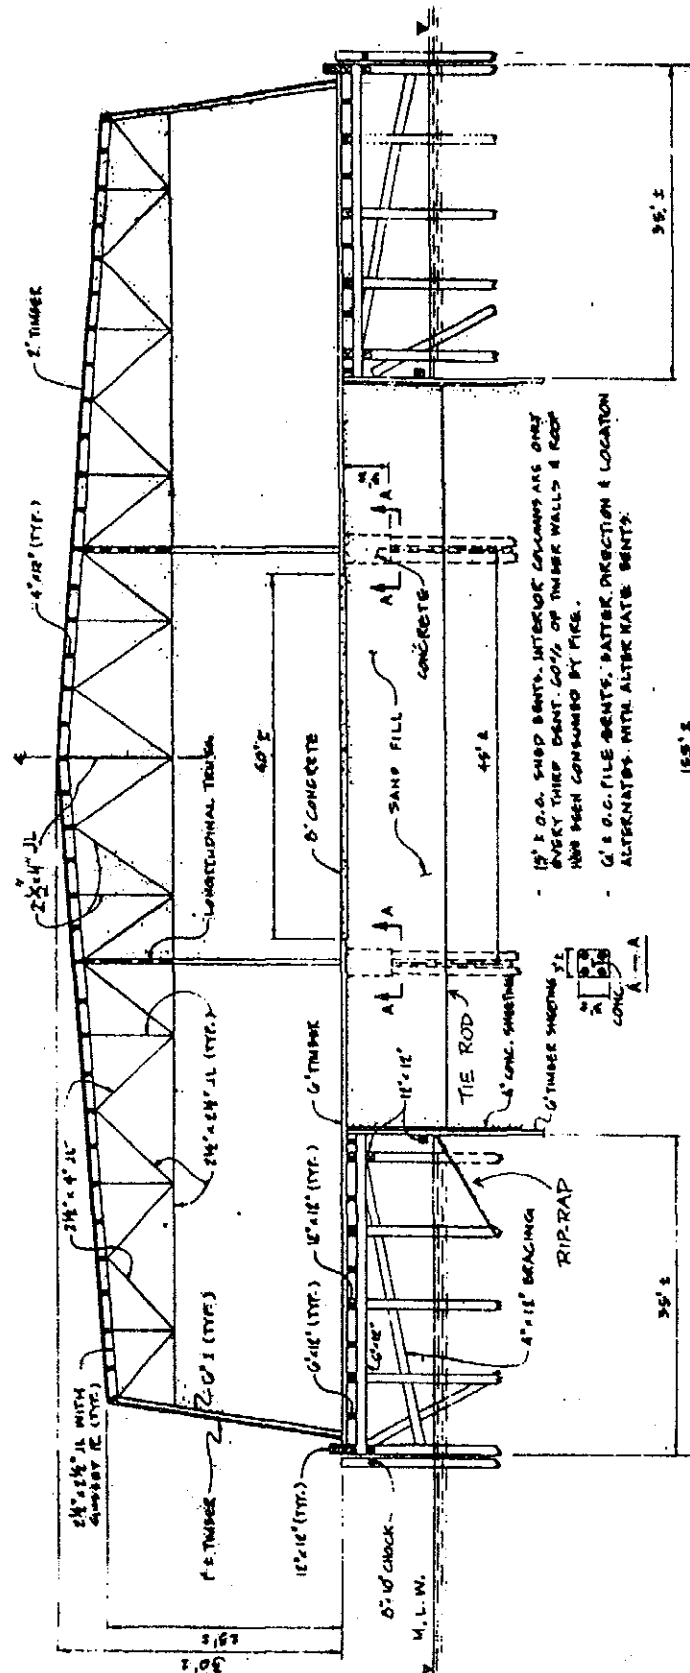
TYPICAL CROSS SECTION OF PIER 5
